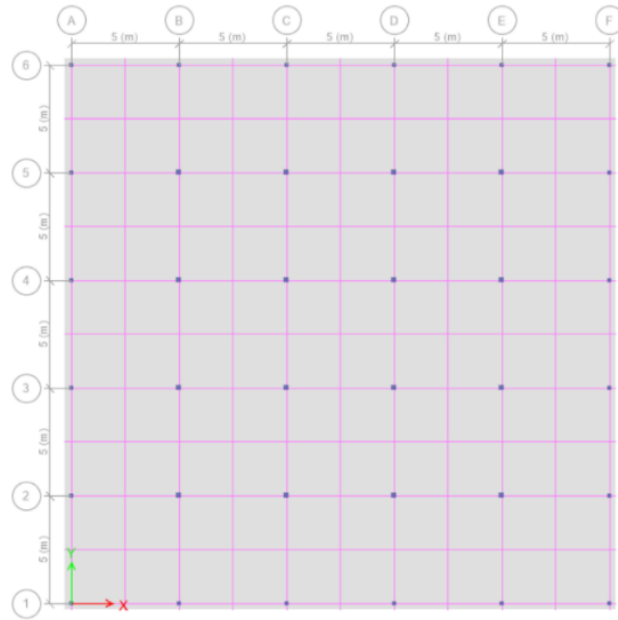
Plan of 8-story building (Flat slab/ Type A)
